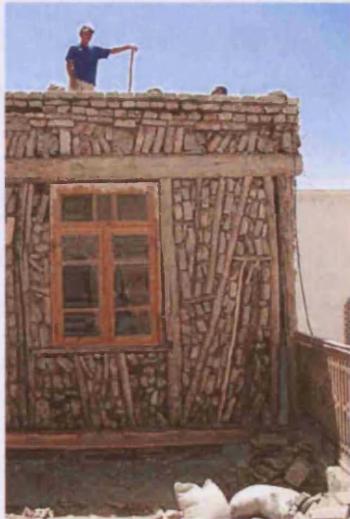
Sintch building with fired brick infill between splayed timbers, Bukhara, Uzbekistan (UZ02_0069).
